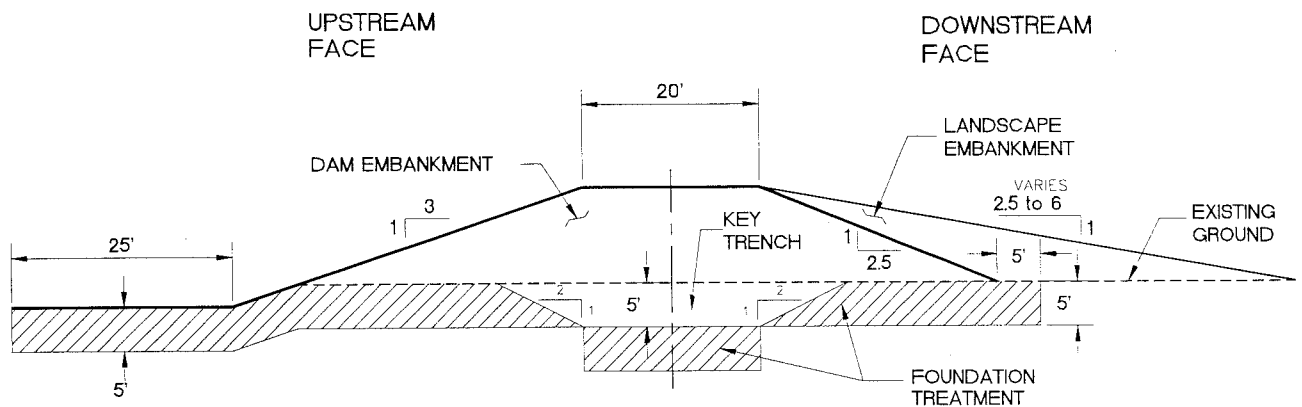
TYPICAL EMBANKMENT SECTION
